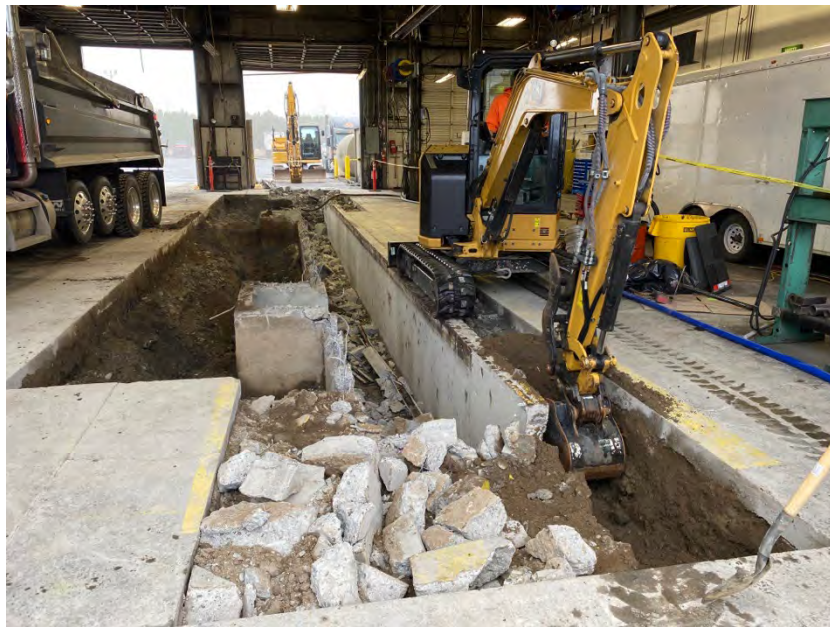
View east of the excavation of soil along the south side of the mechanic pit. Due to City of Portland building structural requirements, the excavation could not advance further south.
